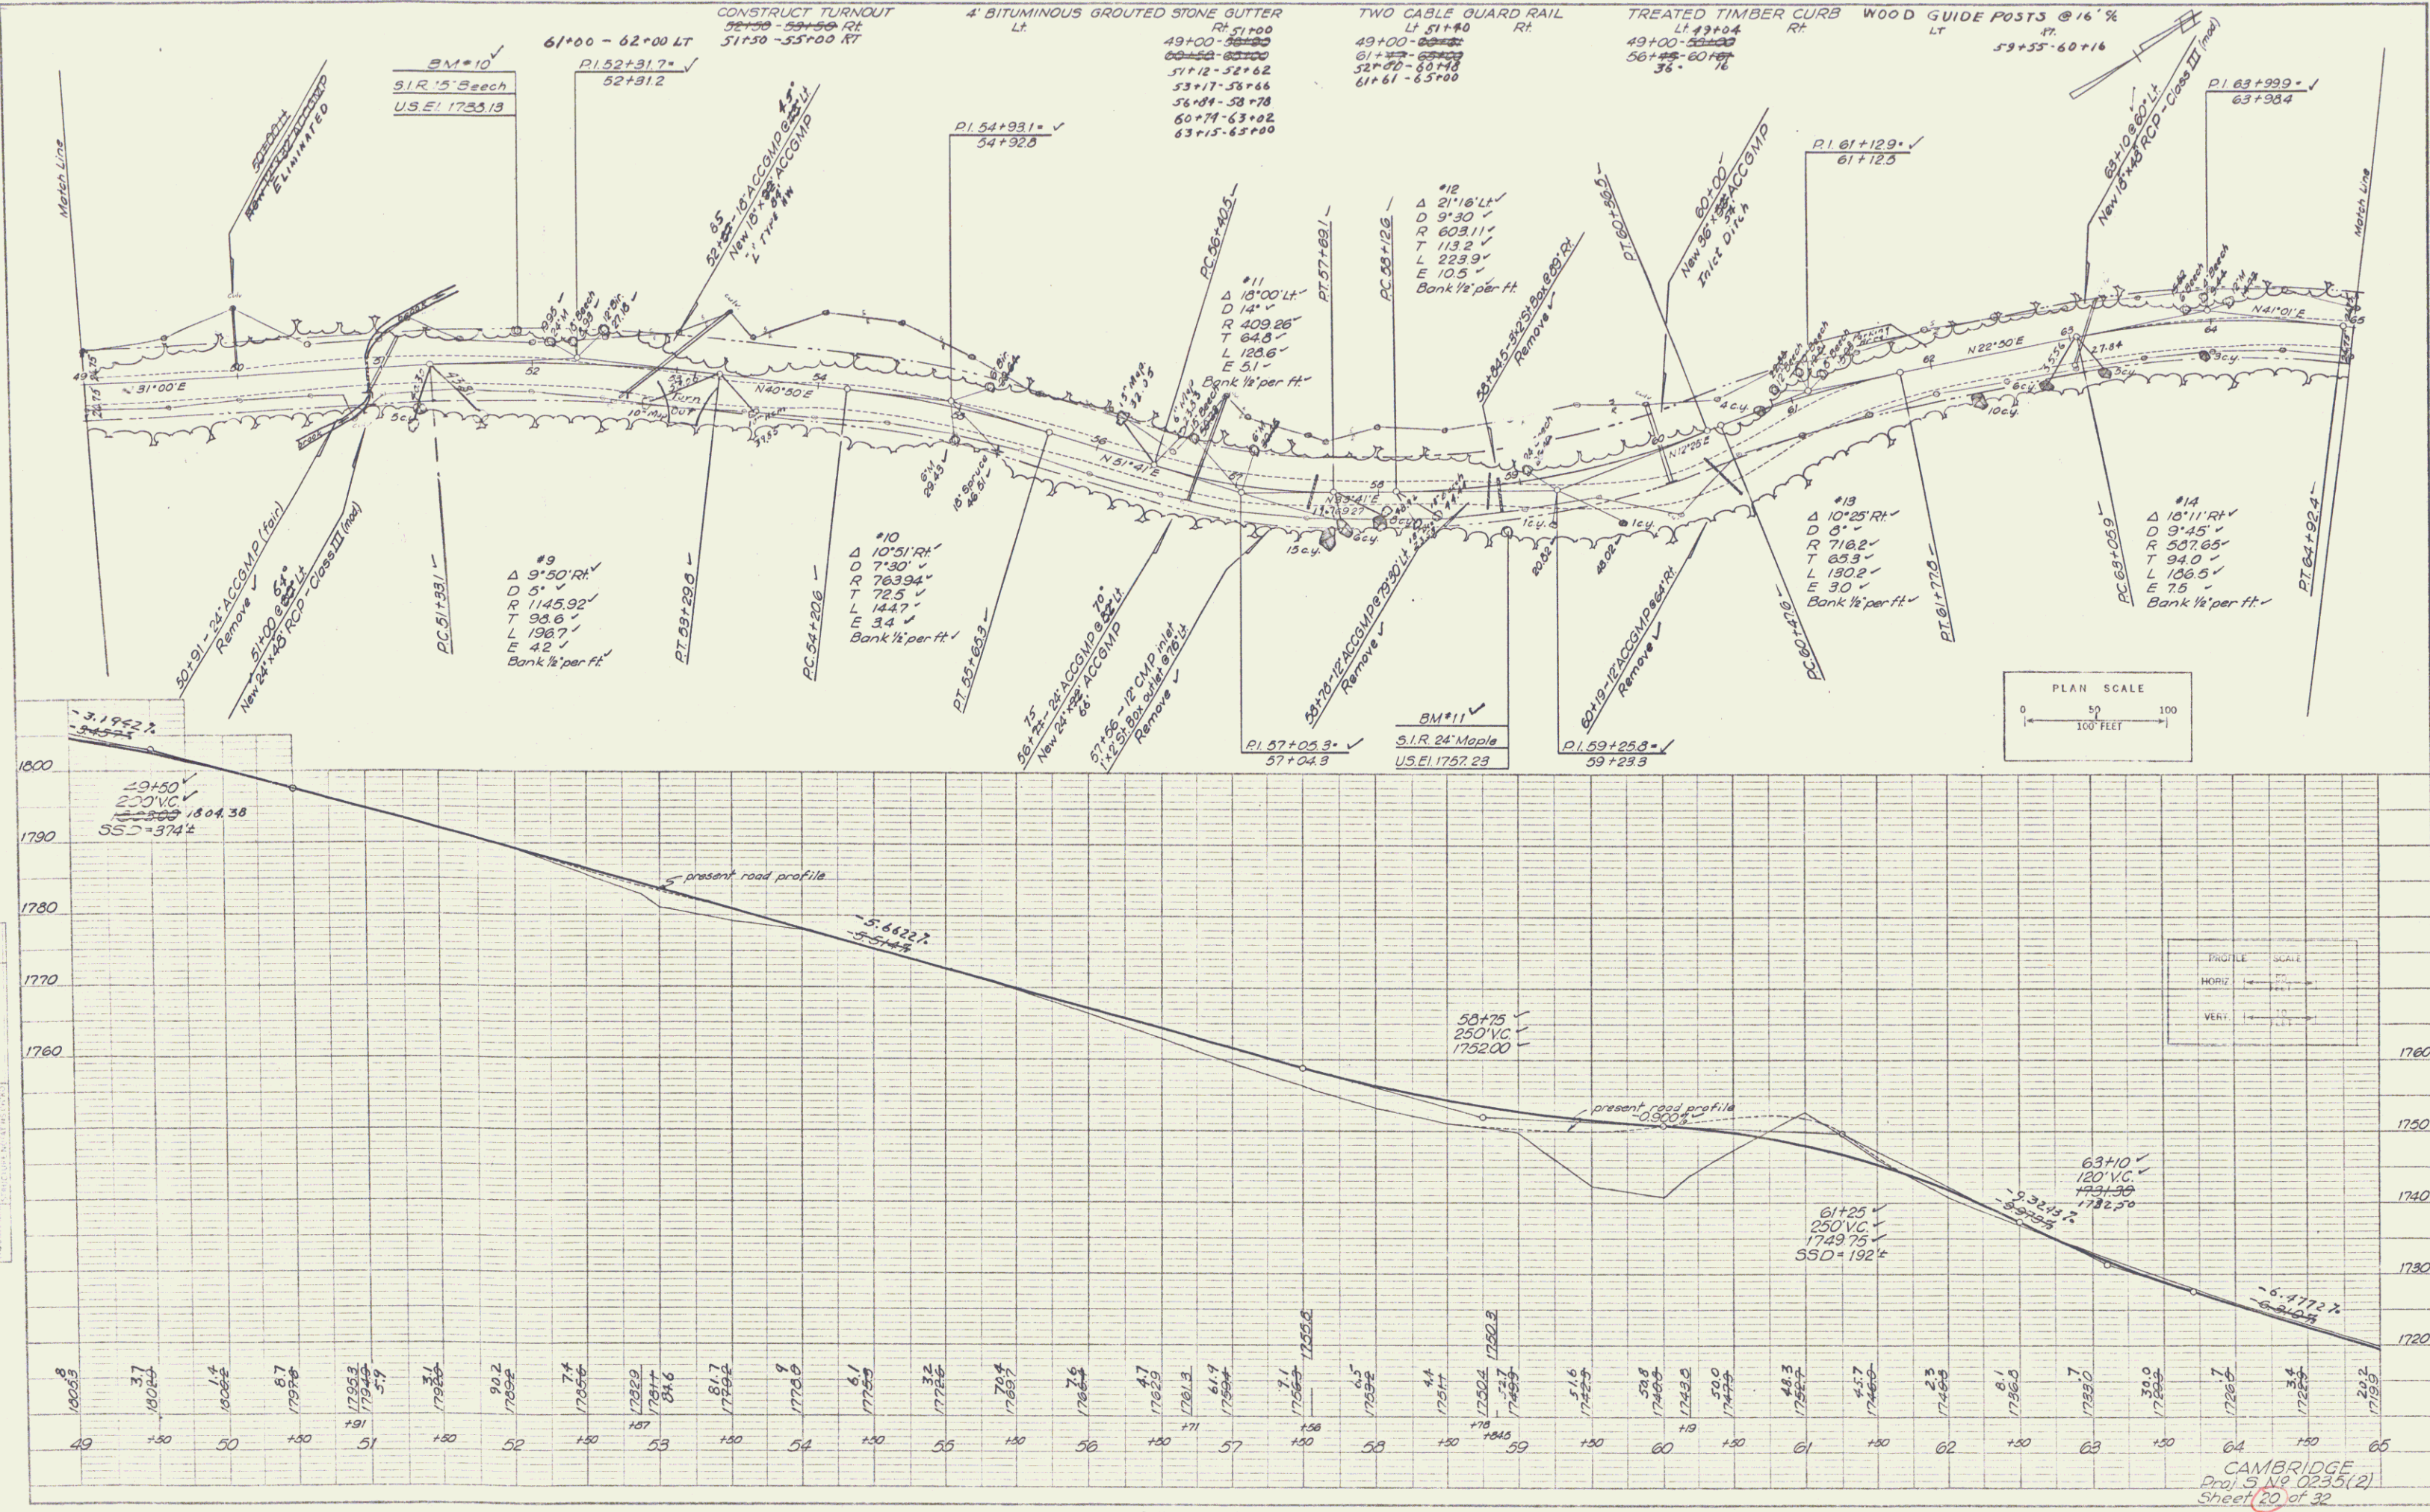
PLAN, PROFILE, & P & R, STANDARD
